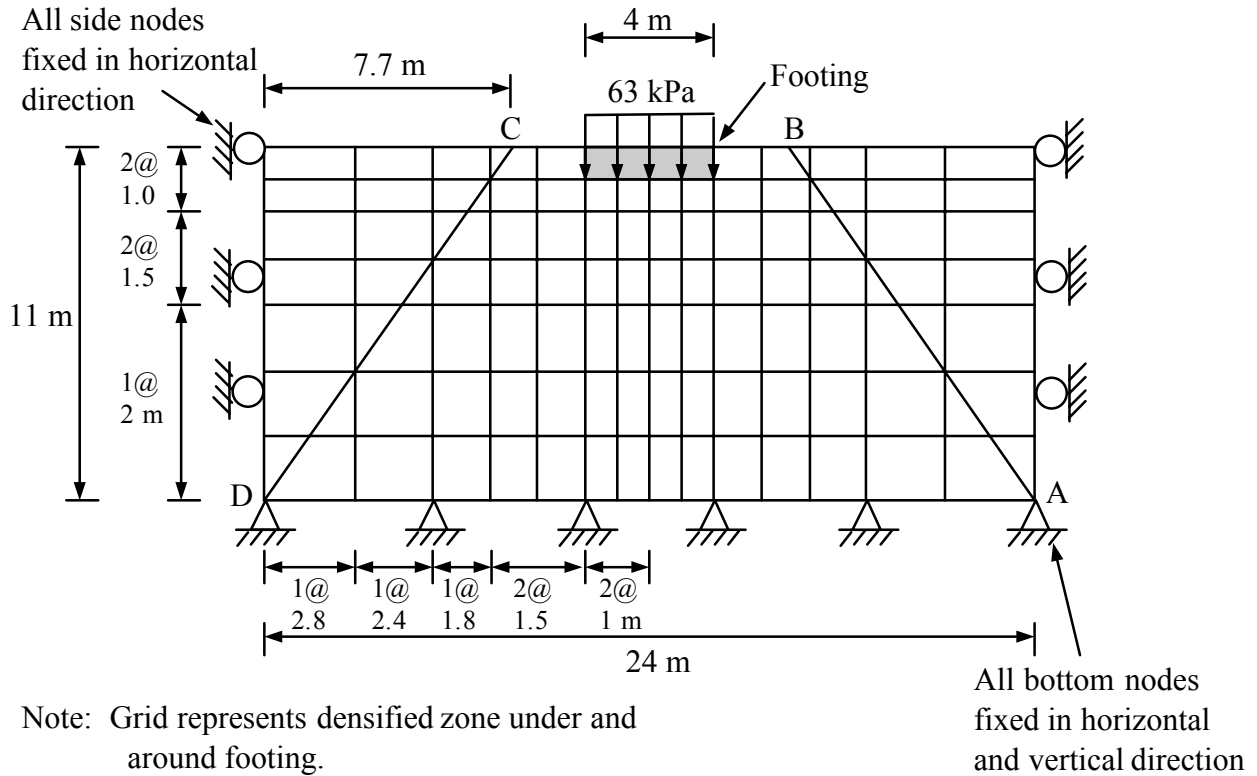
Improved Zone at Bridge Stub Abutment
